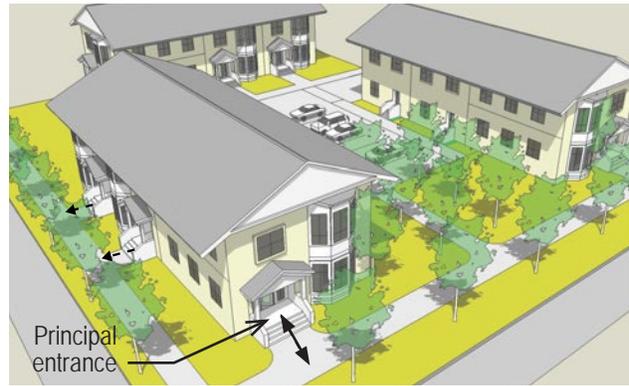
d.7 (1): Connection to principal entrance directly from sidewalk.
